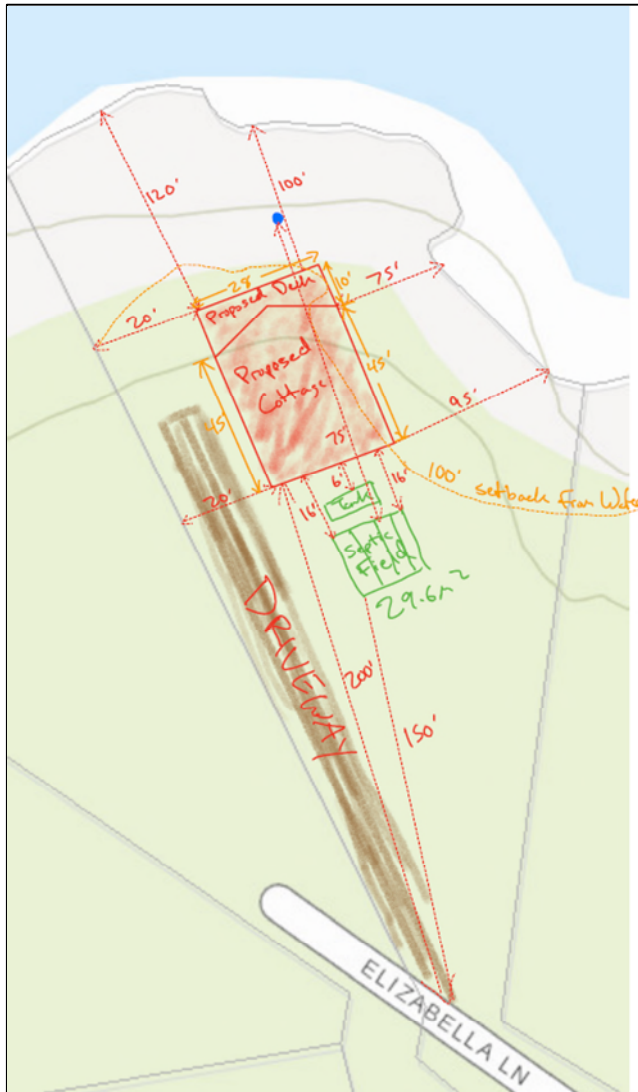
Revised site plan submitted by applicant (drawing is not to scale)
